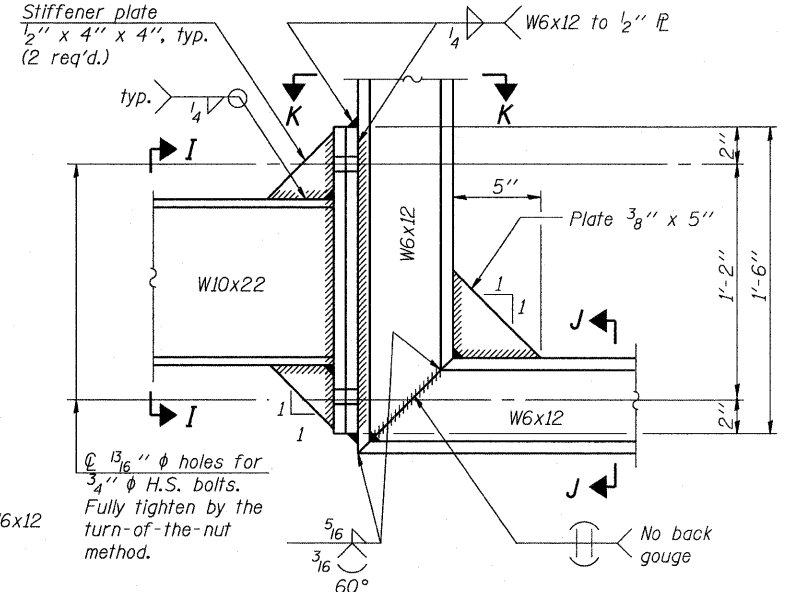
DETAIL B - WELDED W10x22 TO W6x12 CONNECTION
